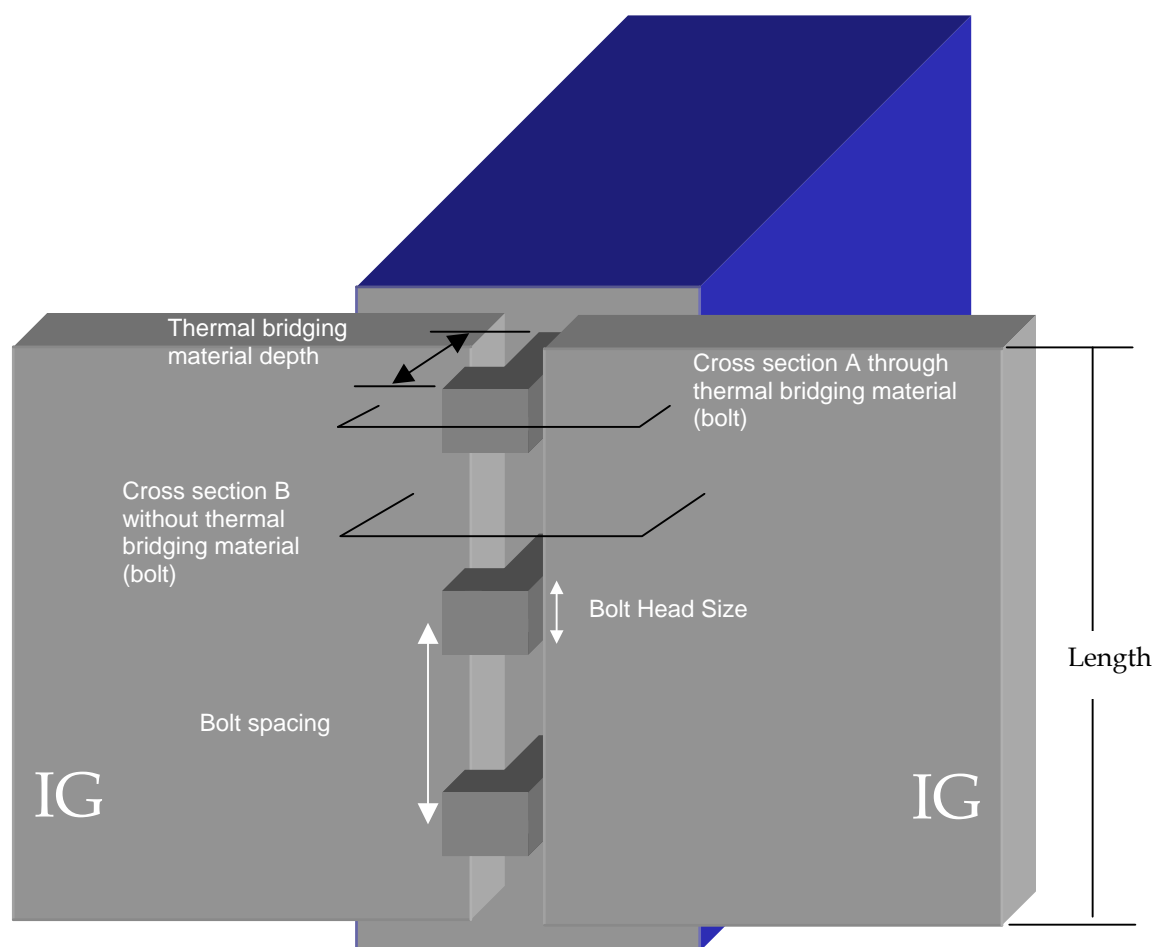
Example of a curtain wall system with regularly spaced bolts which act as thermal bridges.
